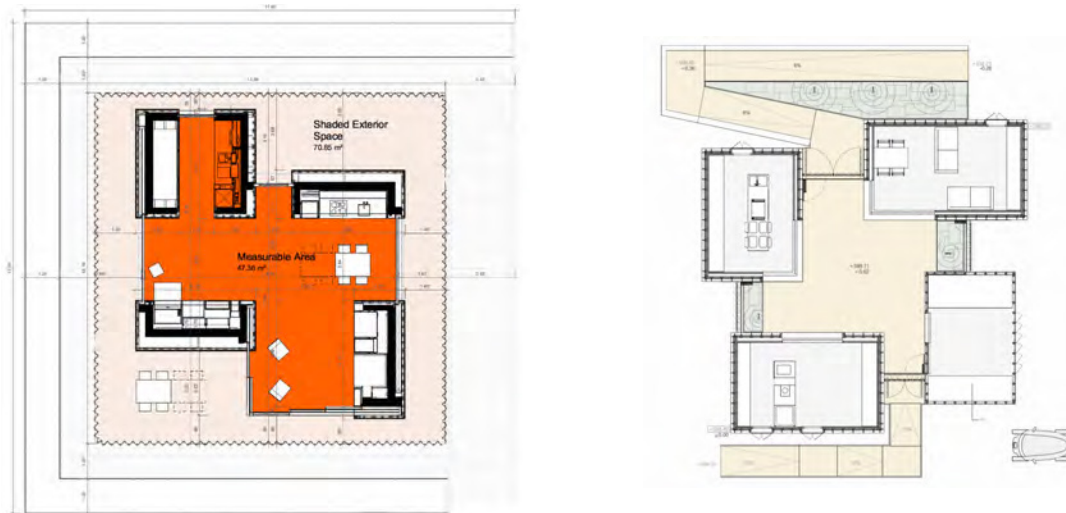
Patio 2.12 (left) and Counter entropy house (right) ground floor plans.¹⁰³
